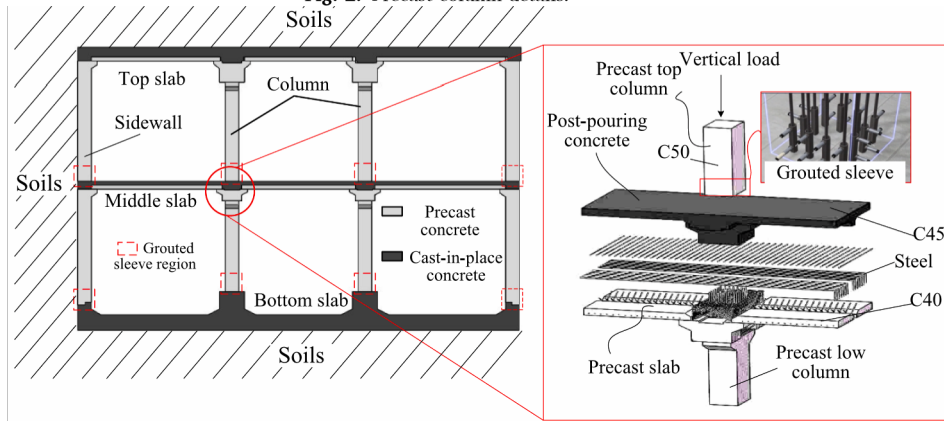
Cross-sectional plan of assembled monolithic concrete structure [21].
